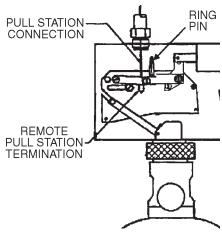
Single Cylinder Installation Using Model ECH3/MCH3/NMCH3 Control Head.
